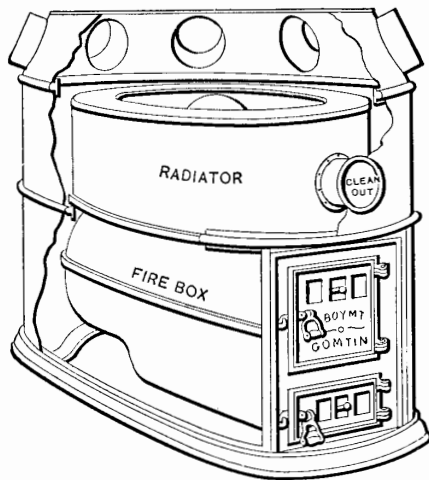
Portable Wood Furnace with Steel Radiator.
